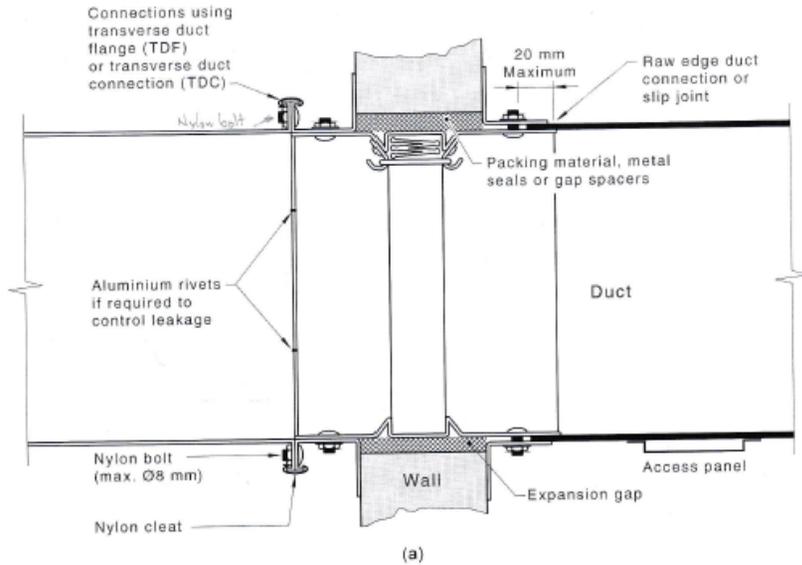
TYPICAL FIRE DAMPER INSTALLATION WITH 'BREAKWAY' DUCT CONNECTION
